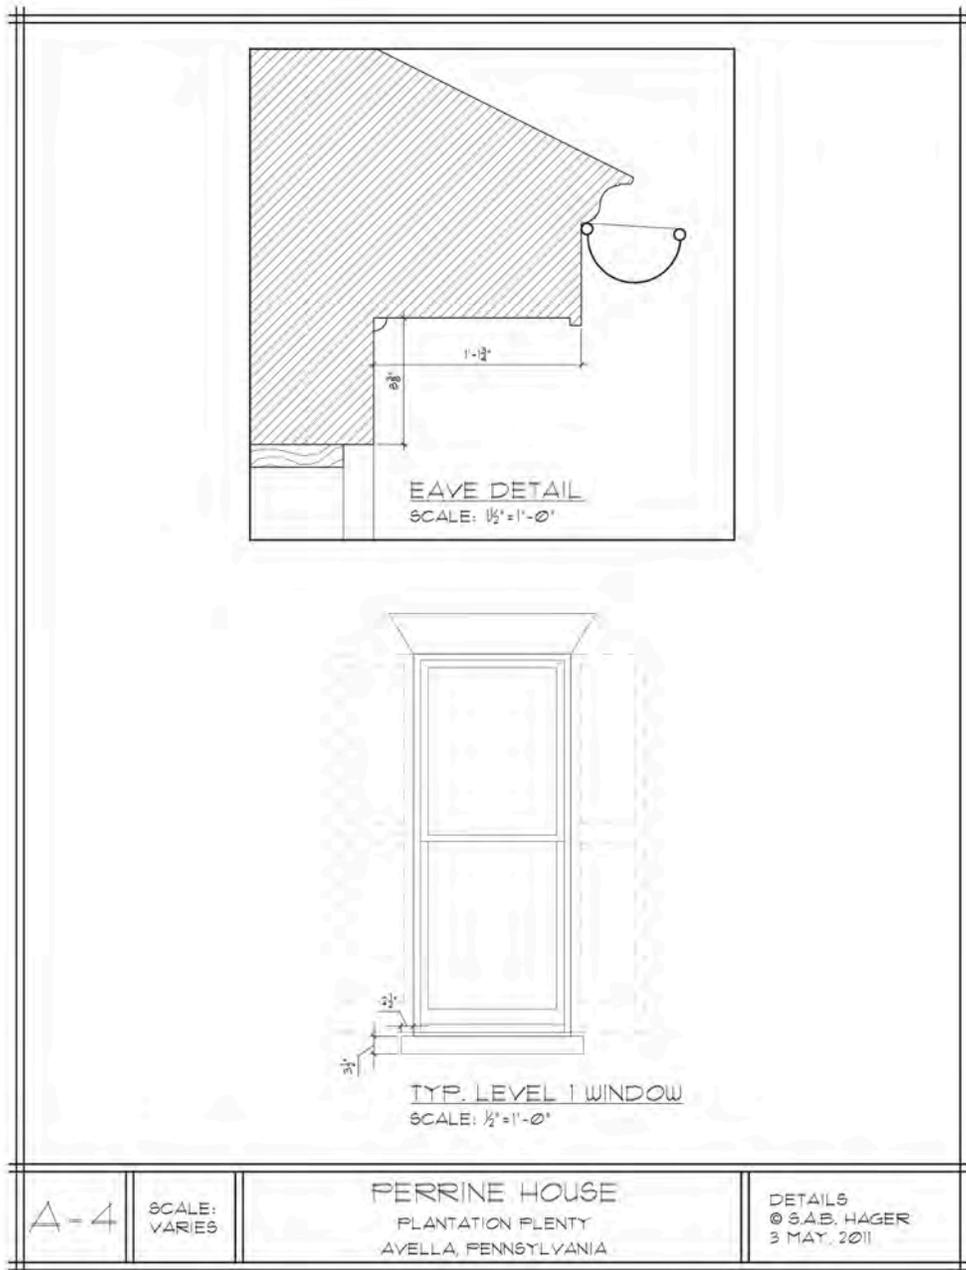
Plantation Plenty Perrin House Eave and Window Details
